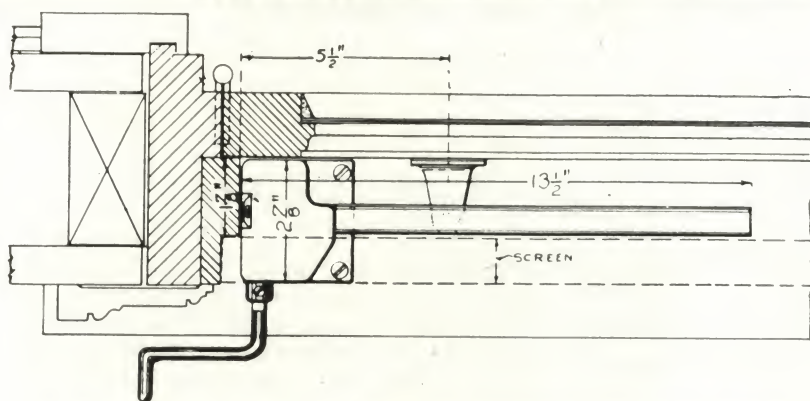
DETAIL SHOWING NO. 194 OPERATOR WHEN USED WITH STEEL SASH.
